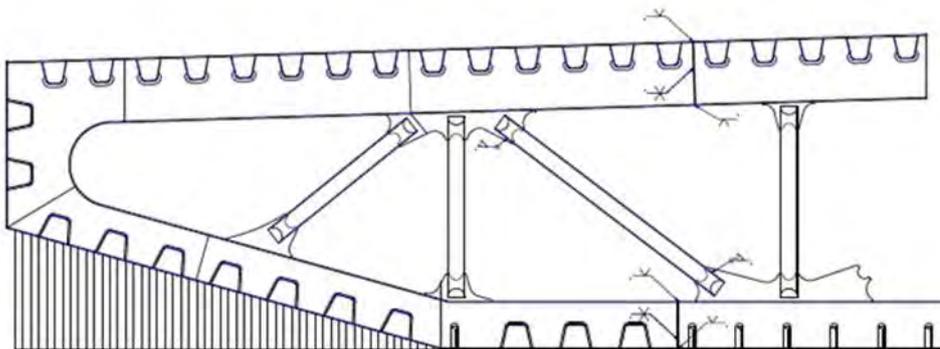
Assembly of complete "left half" of Bridge Girder
